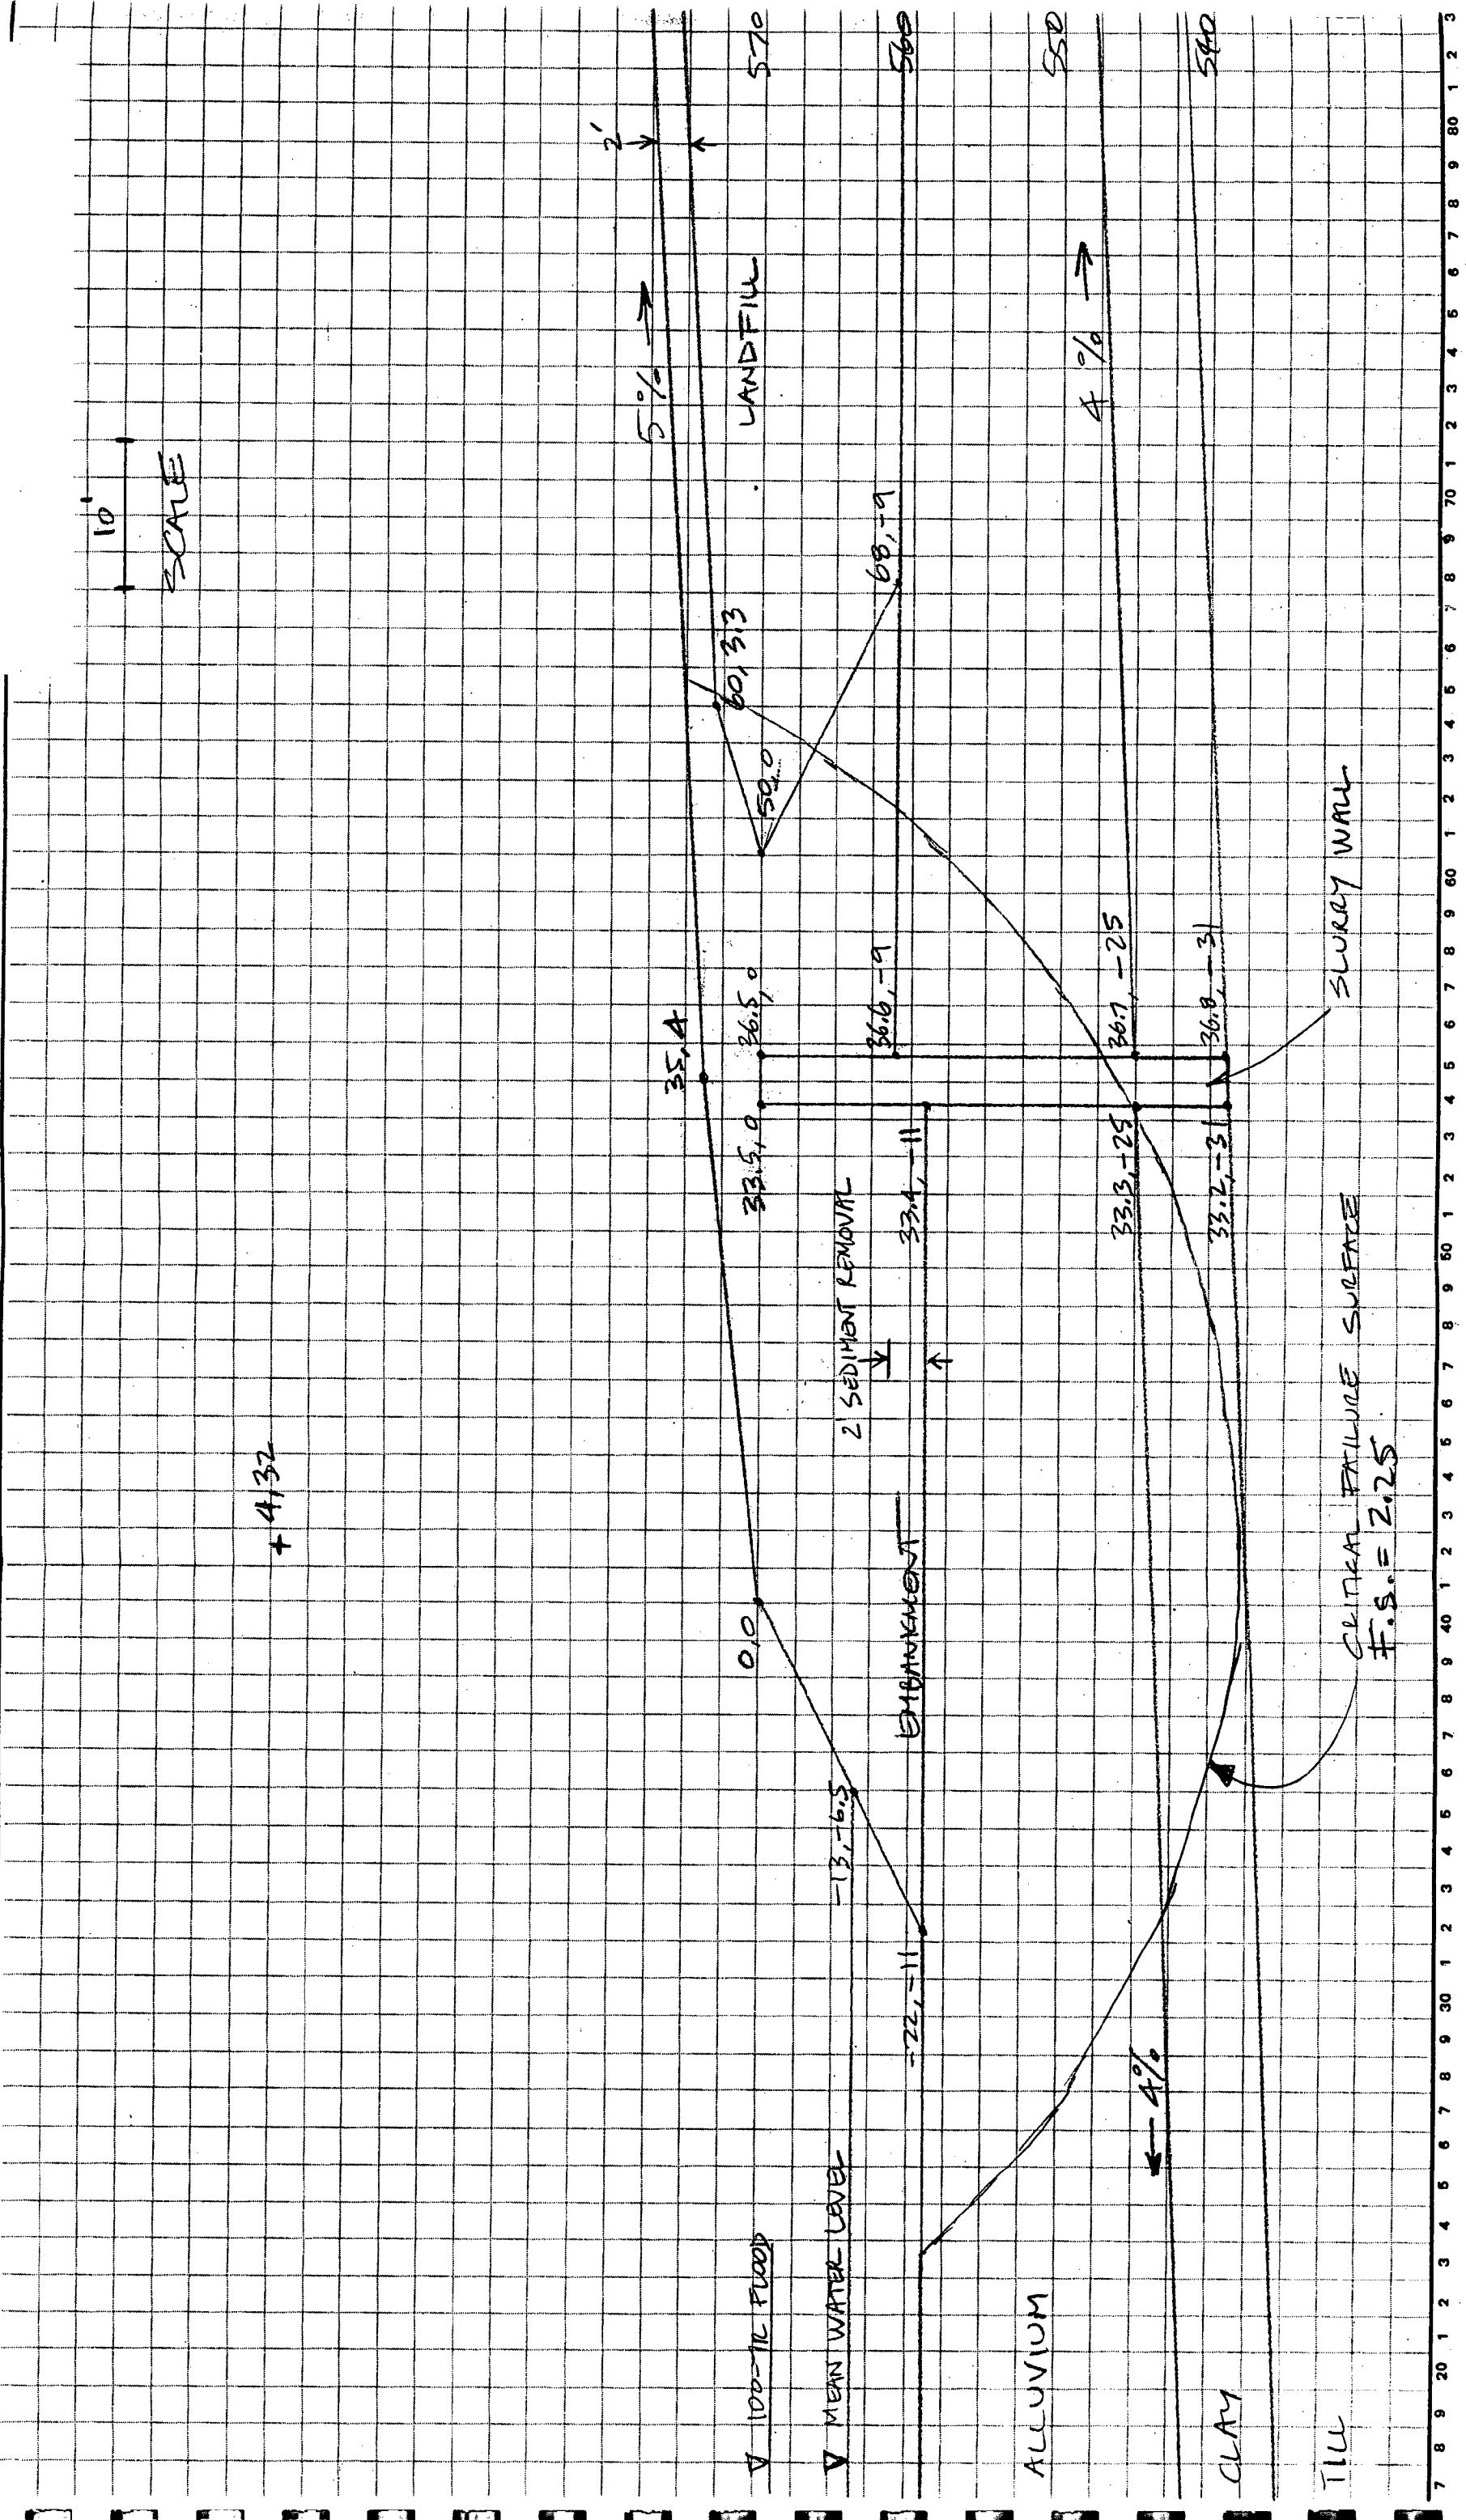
a BULKHEAD, EAST END OF OXYCHEN PROPERTY, CROSS-SECTION NO. 2
